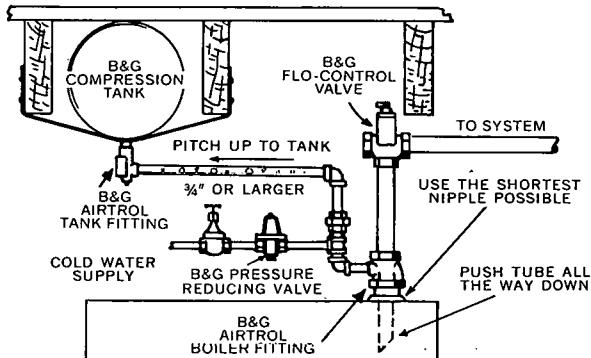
Horizontal piping between boiler and compression tank must be full size of tapping in the Airtrol Tank Fitting. If horizontal pipe length is more than 7 feet, increase to next larger size pipe—two sizes larger if horizontal pipe is more than 20 feet. *Do not use a valve of any kind between the compression tank and boiler!* It is unnecessary and prevents free passage of air into the tank. If a valve must be used, install a gate valve in the vertical pipe line.
